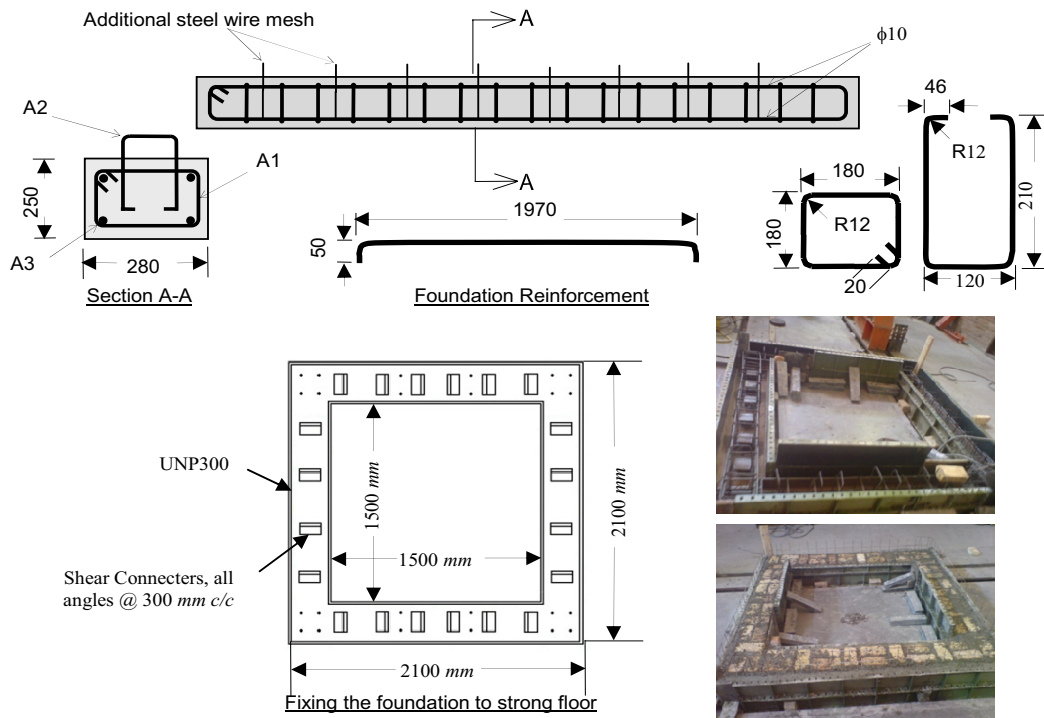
Foundation reinforcement and shear connectors welded to the fixed steel channels
